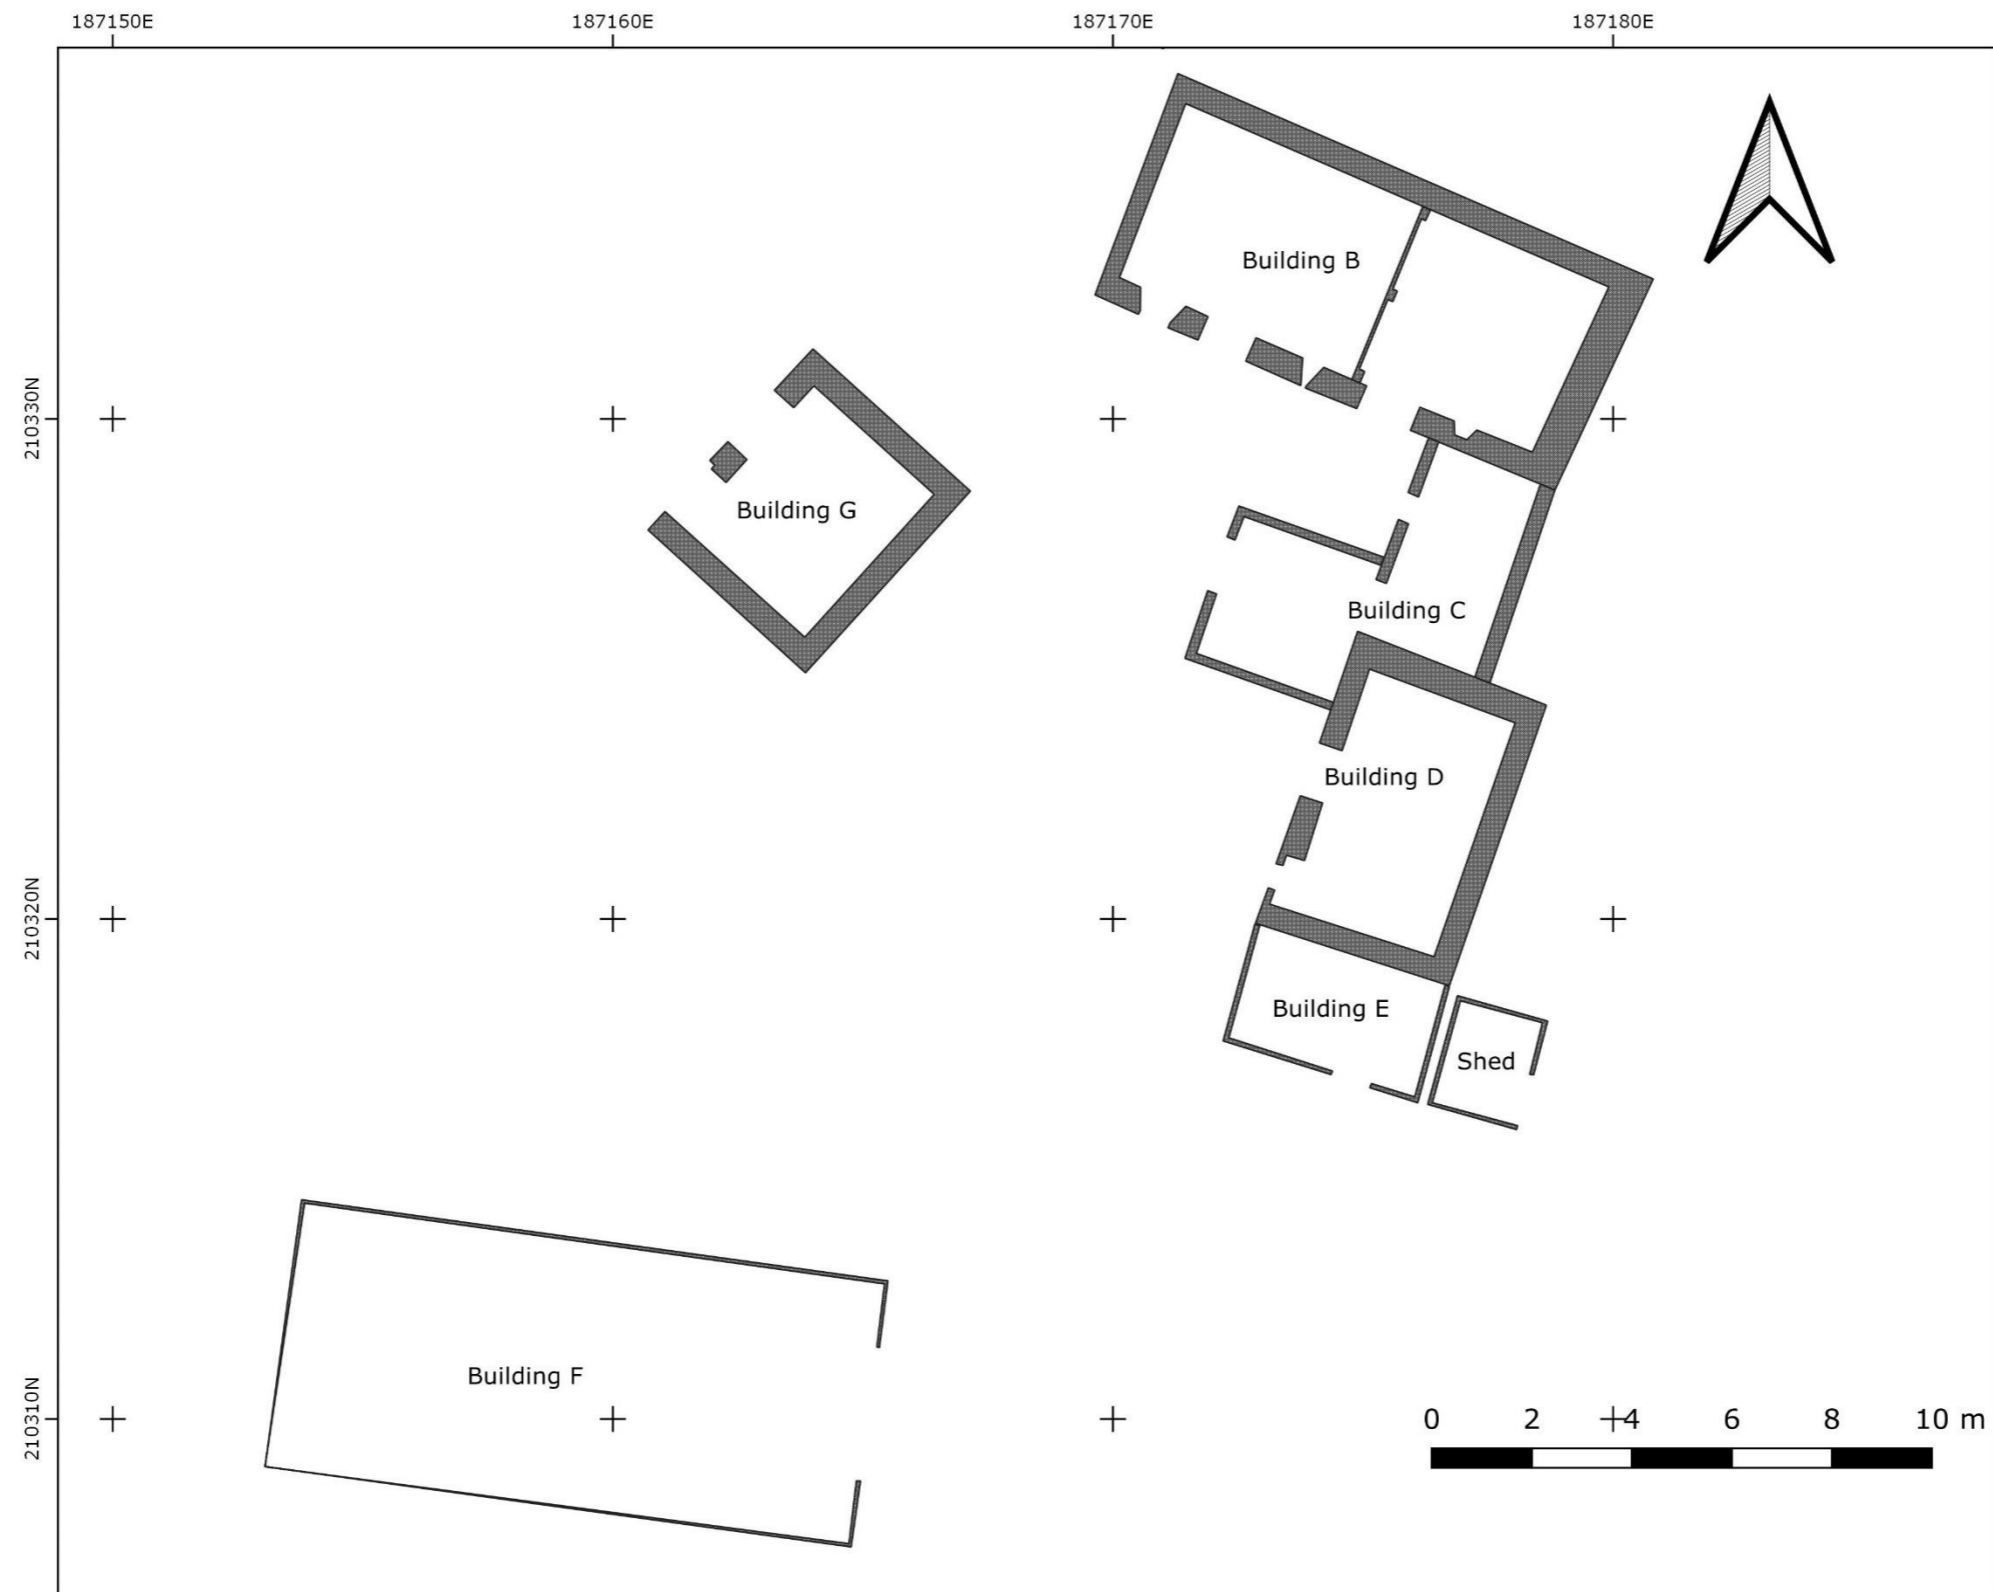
Floor plans of the buildings (based on Acanthus Holden plans)
